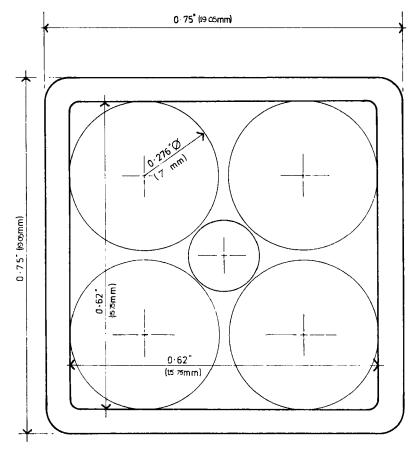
Cross-section of multiple-wire arrangement for poststressed timber beams.
